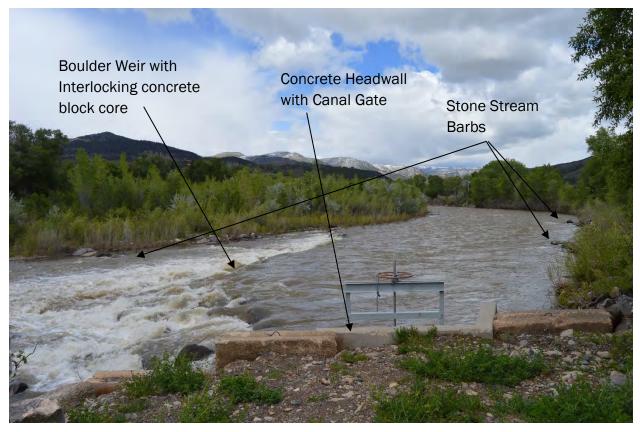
Boulder Weir and Concrete Intake Structure for Paonia Ditch
